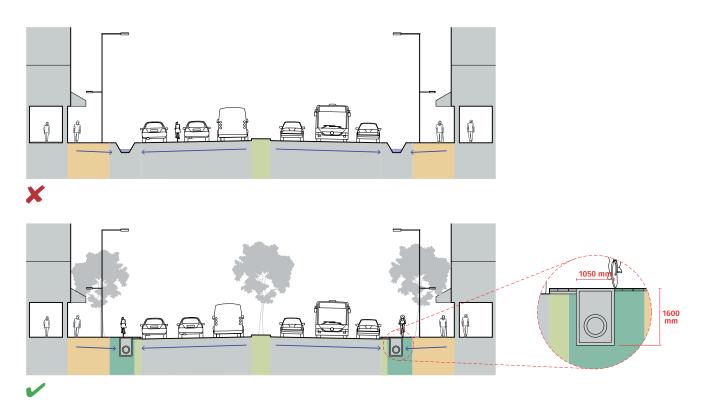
On collector and arterial streets, storm water should be carried underground to free up space for cycle tracks, wider footpaths, trees, and street furniture.
